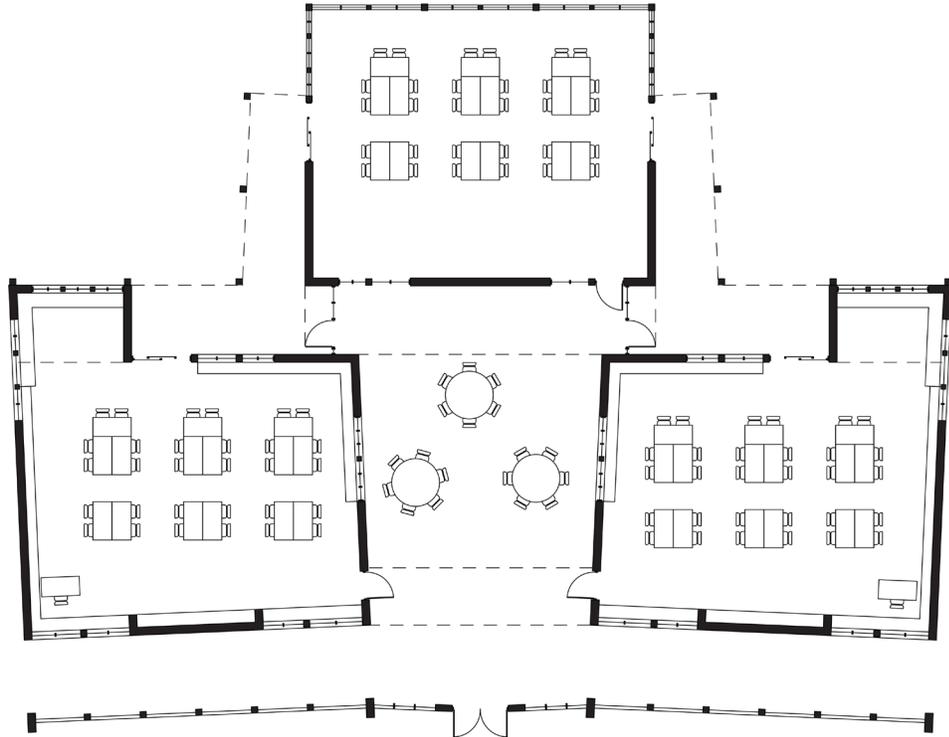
Lawler. Classroom pods are arranged around a central breakout space.
